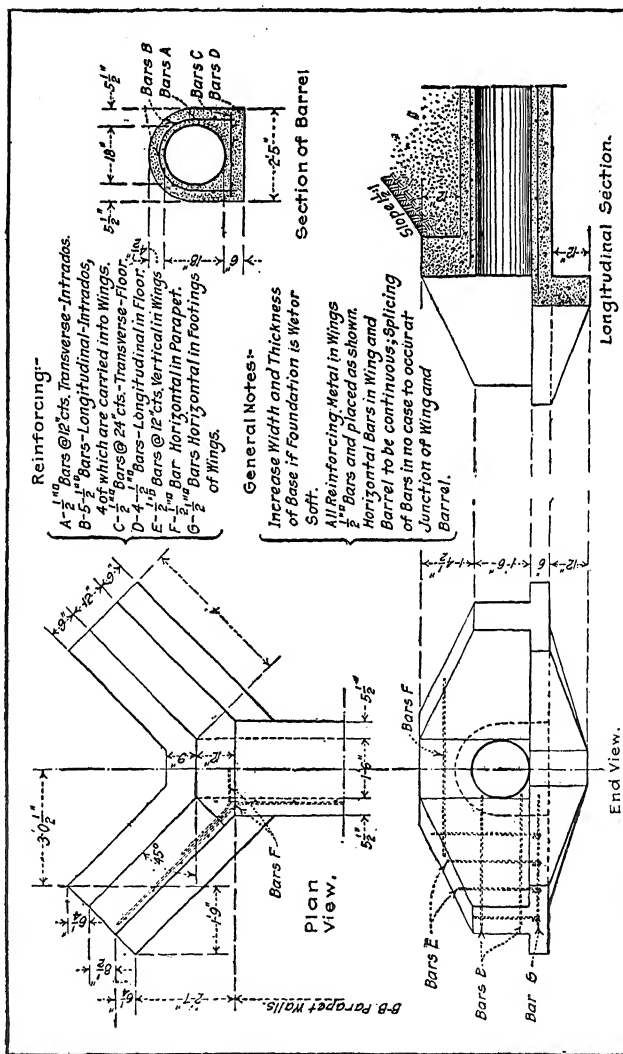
State of Iowa 18 in. circular concrete culverts.
